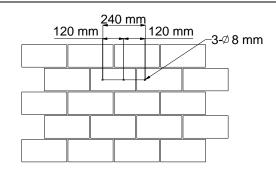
Drilling holes for R5-(0.7K-3K)-S1-15
